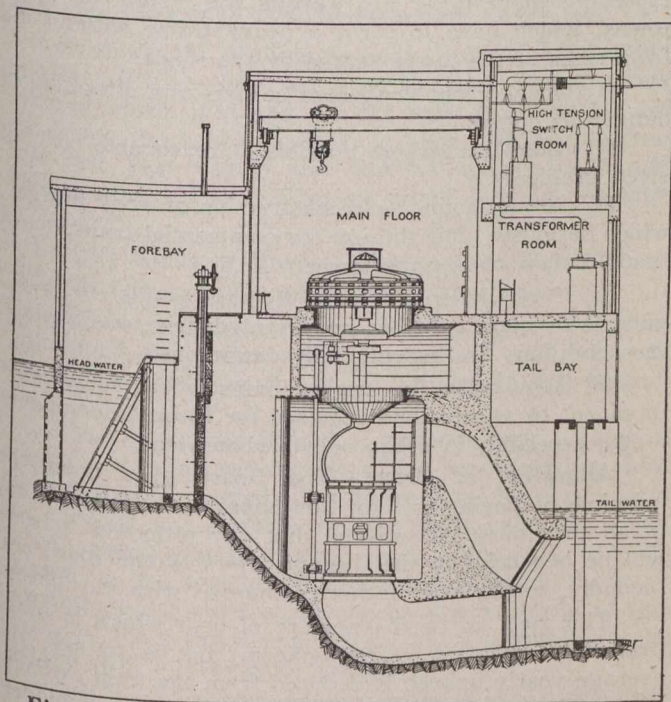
Cross-section of Power-house at Wasdell's Falls.
